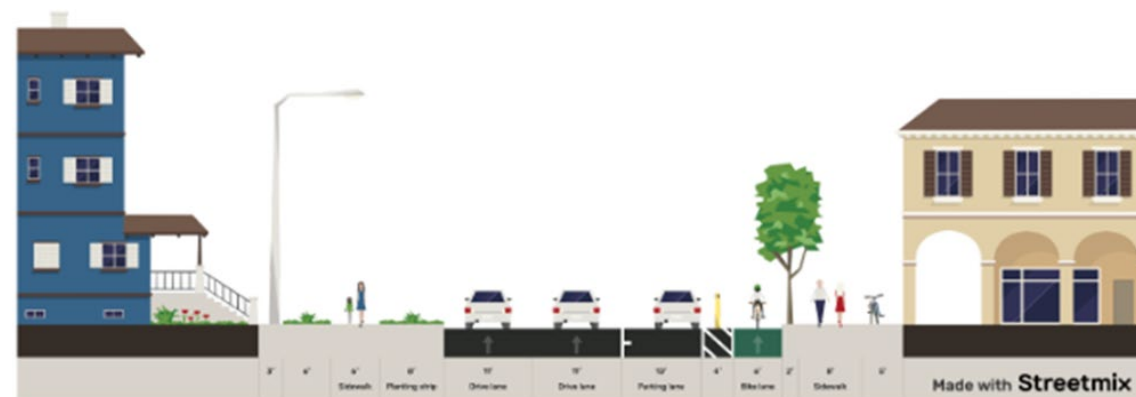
5th Street Recommendation 2 Option 2, one-way road diet and redesign
